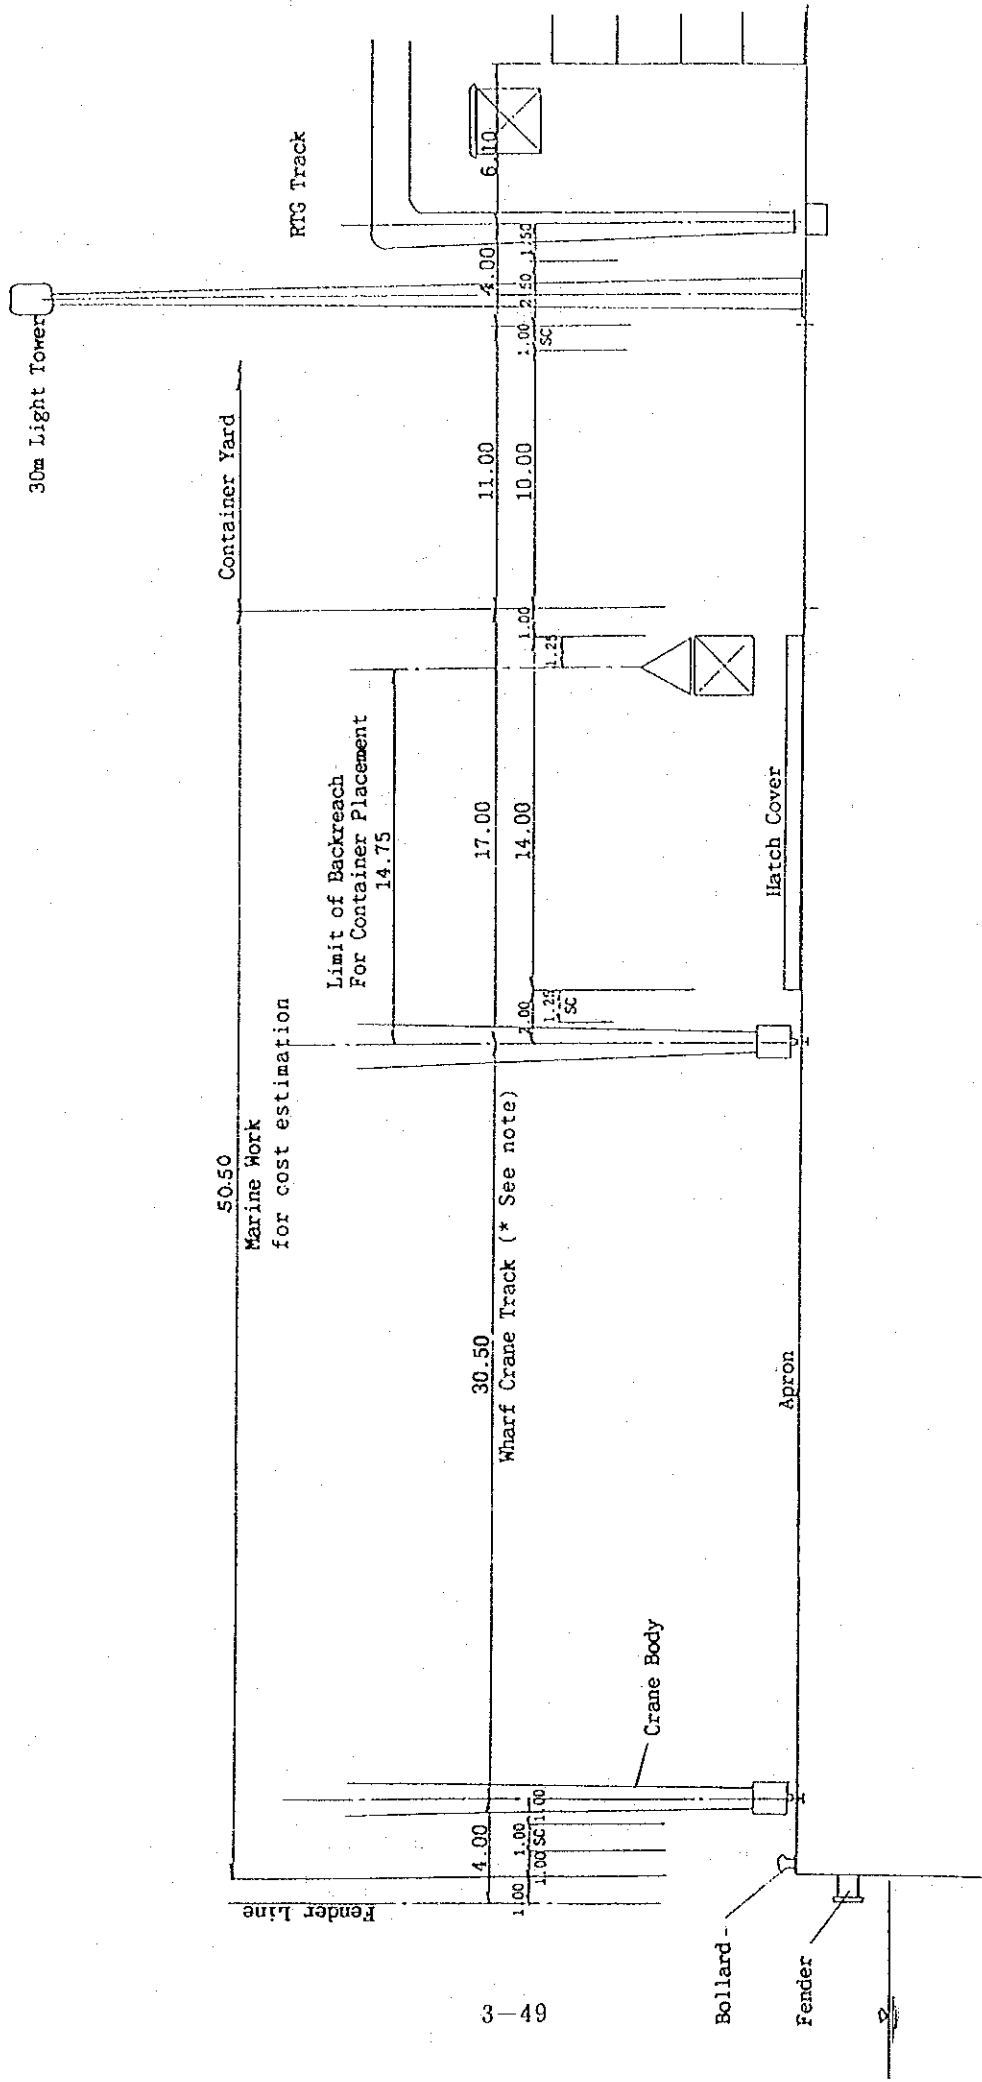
Wharf Crane and Apron Use Arrangement (Typical)
